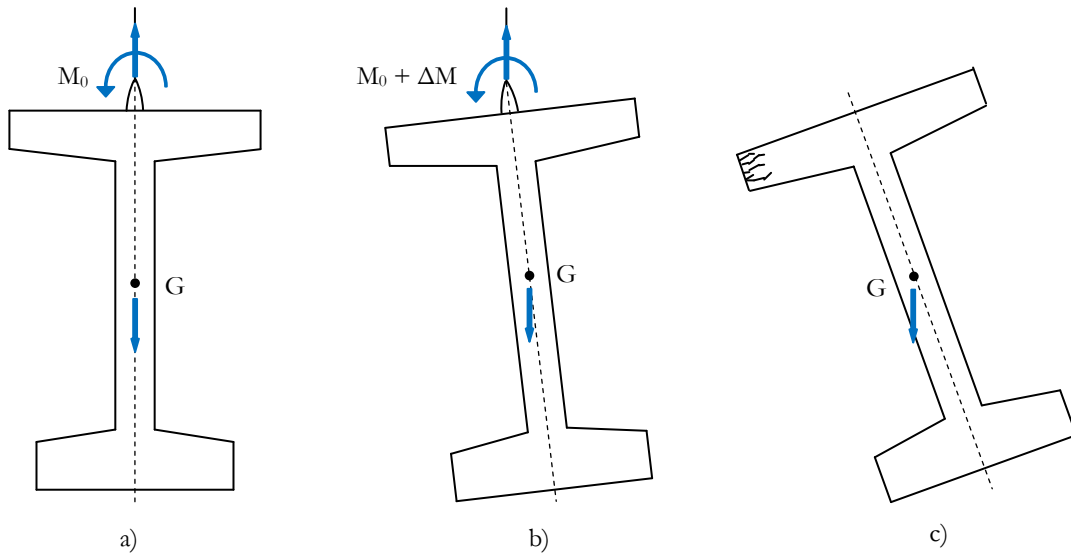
15. Imperfect beam hanging from cables: a) cross section subjected to an overturning moment due to lateral sweep, b) rotated configuration, c) cracking of the top flange due to excessive bending about the weak-axis at midspan.
